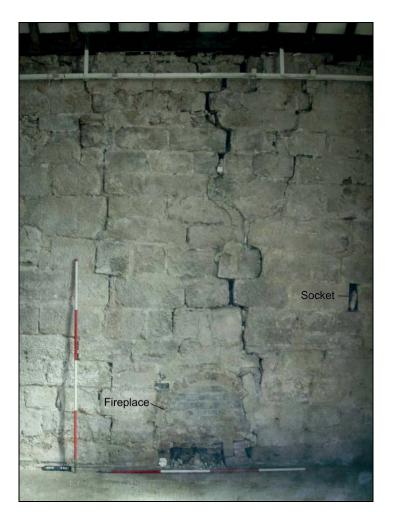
Eastern end of north wall showing fireplace, cracks and socket. (Scale: 2m)
